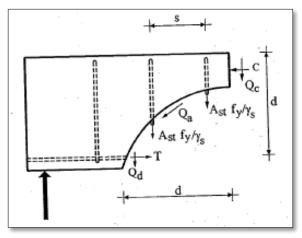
Forces at Diagonal Crack of Reinforced Concrete Beam
